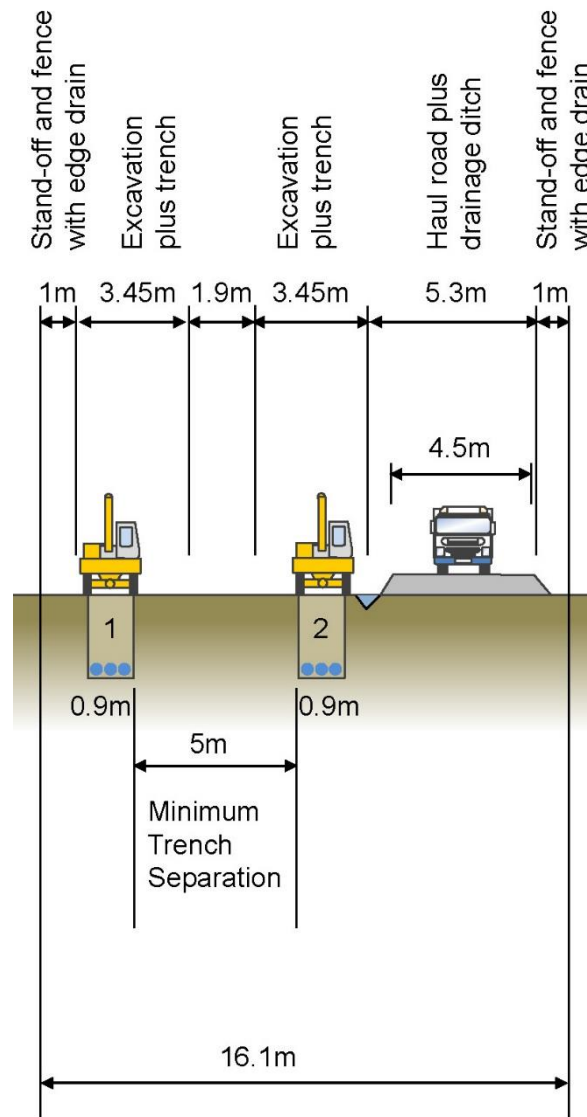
Indicative cable trenching arrangement and working area for reduced working width (East Anglia ONE North only)
